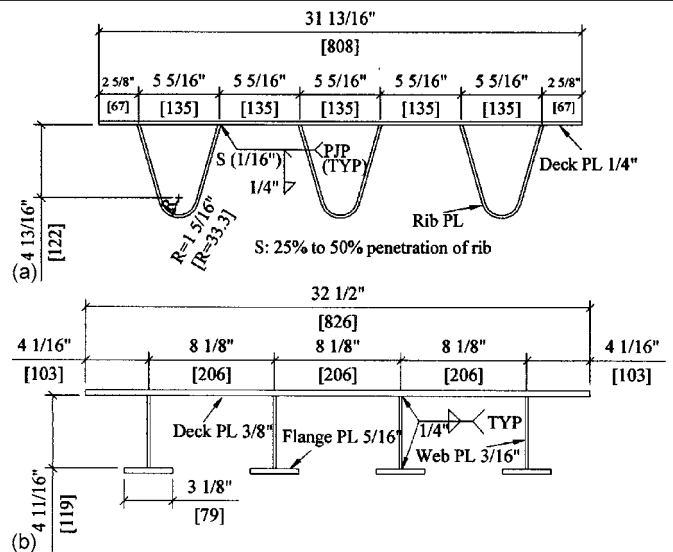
Specimen cross sections: (a) Specimen 1; and (b) Specimen 2
